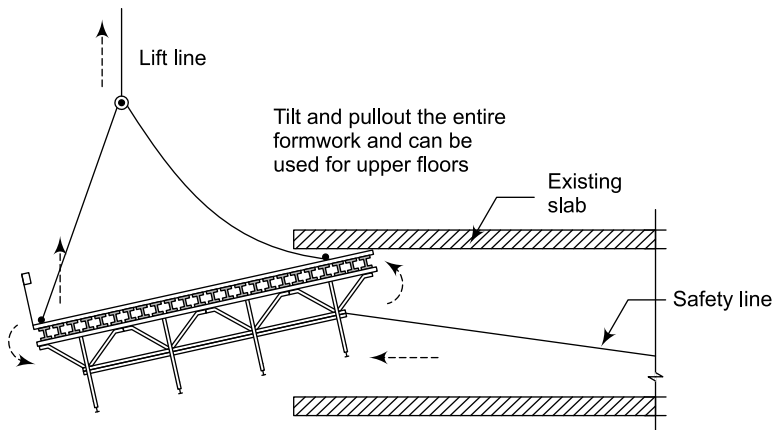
Tilting of Form When About Half the Form Panel is Out of the Floor.
